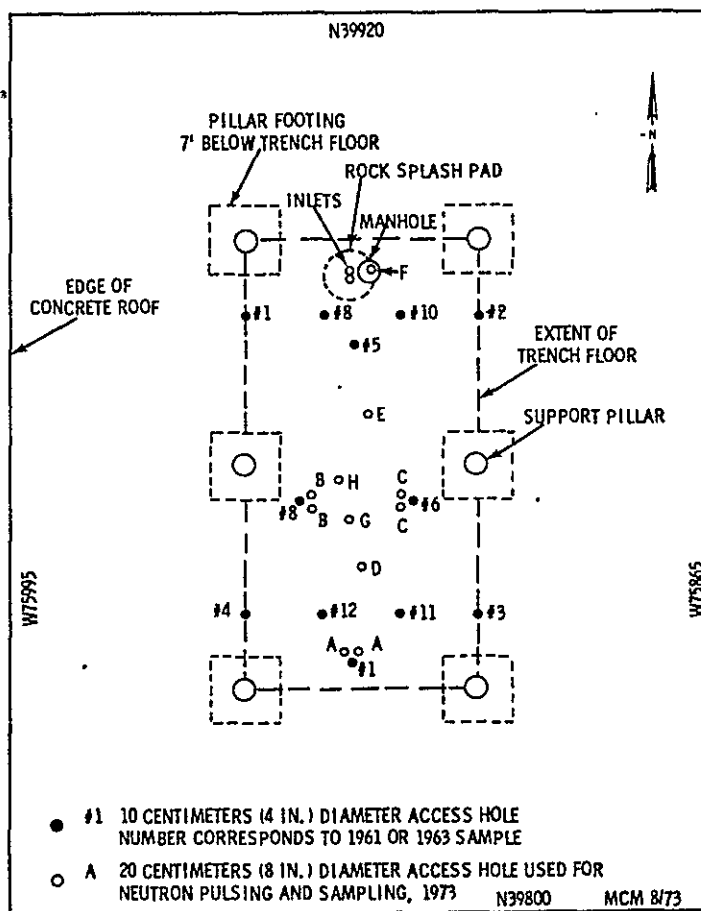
C-44 216-Z-9 TRENCH SHOWING LOCATIONS OF ACCESS HOLES
